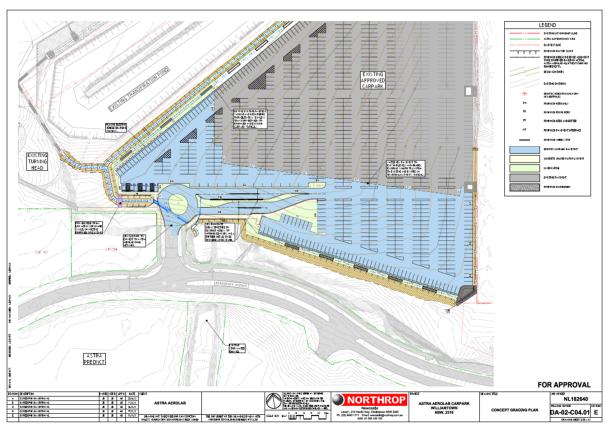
Car Parking – Concept Grading Plan. Source: Northrop (20/10/2022)
